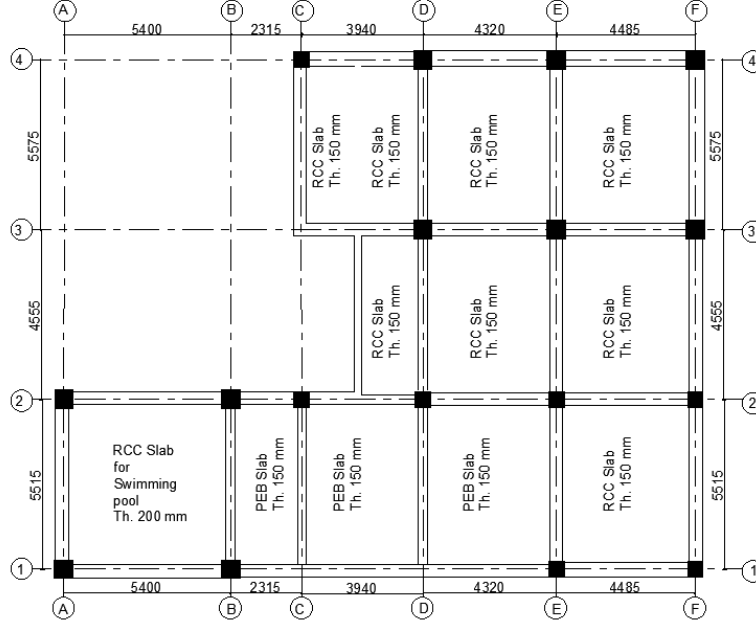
Schematic representation of the slab plan at the G+2 floor level above Columns A1, A2, and B1 where 2 ISMC sections installed as columns
